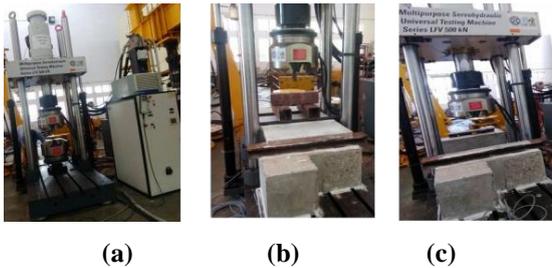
(a) Testing machine (b) Flexural test setup (c) Test setup after placing slab
